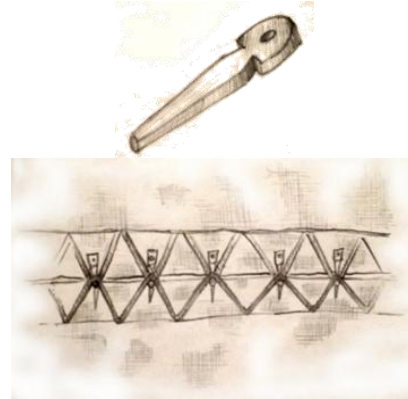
connection of two parts of the roof with delicate strap or hook and wooden pin. Drawing by author
